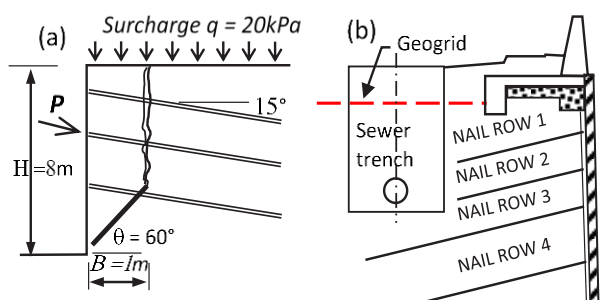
(a) Wedge failure mechanism (b) Design of soil nail wall near existing sewer trench
